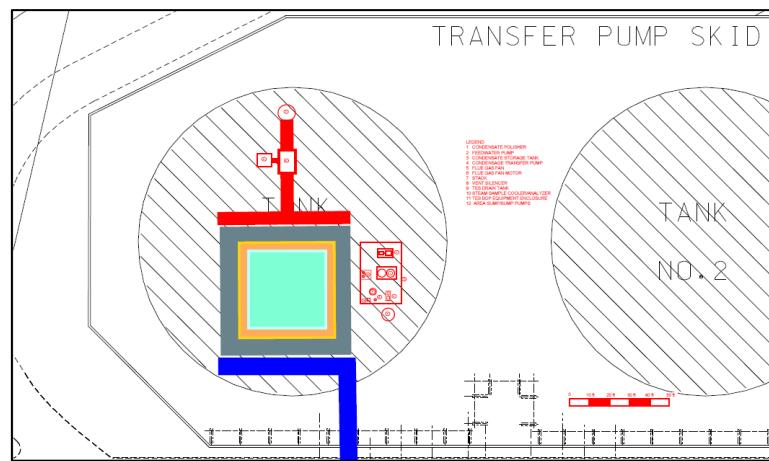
Zeltmann Plant - Mechanical Arrangement - Prepared Tank Location
